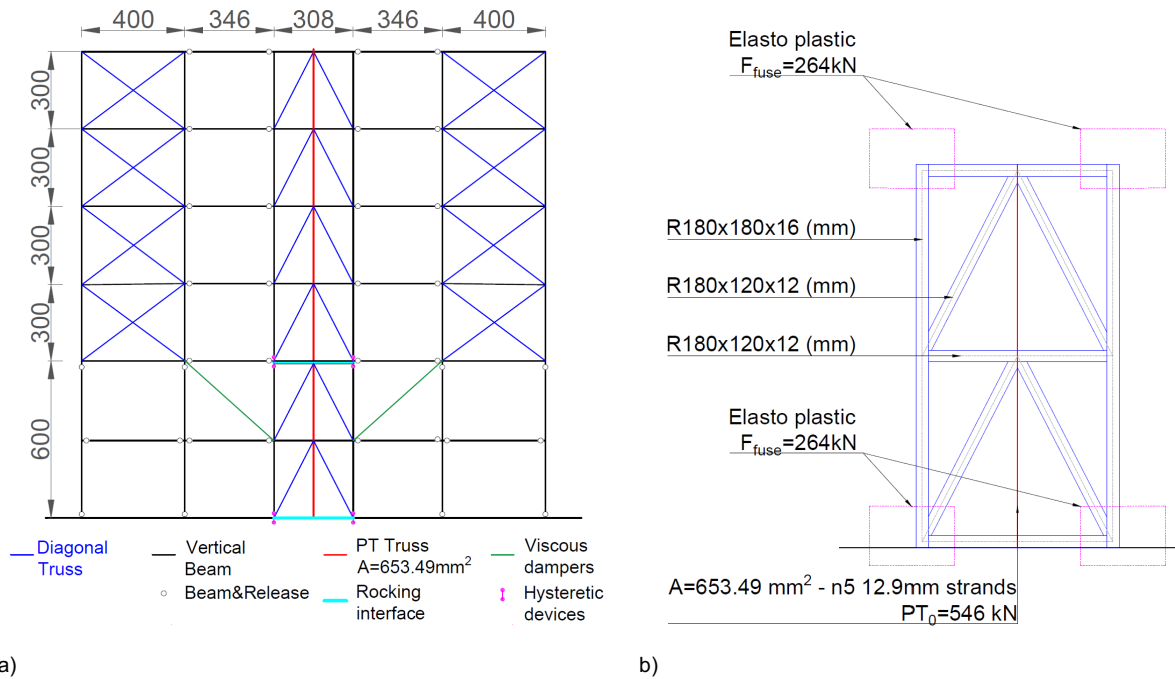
a) Layout of the retrofit solution (dimension in cm); b) Detail of the rocking wall and element dimensions.
